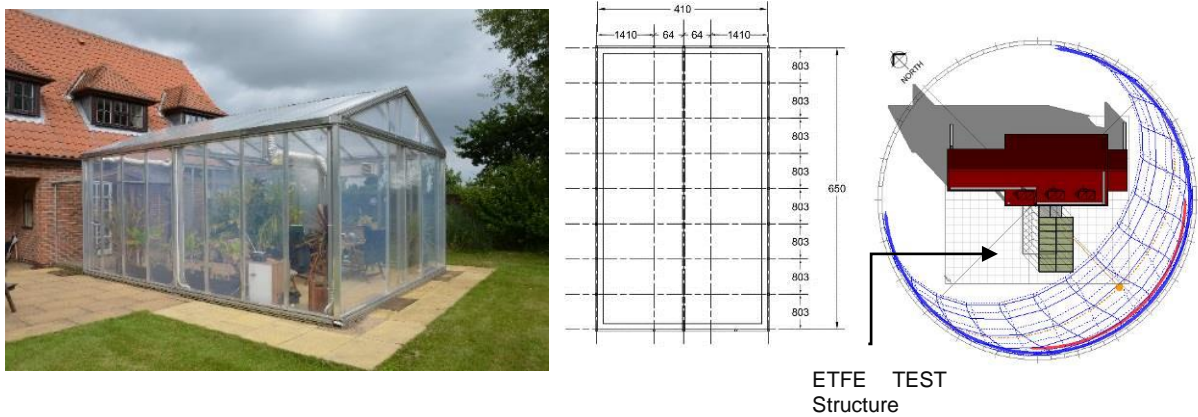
Images of elevations of ETFE Test Structure (source: author), Site Plan with Sun Path Diagram and position of Test Structure to the Pinfold House, and Structural plan of ETFE TEST Structure.
